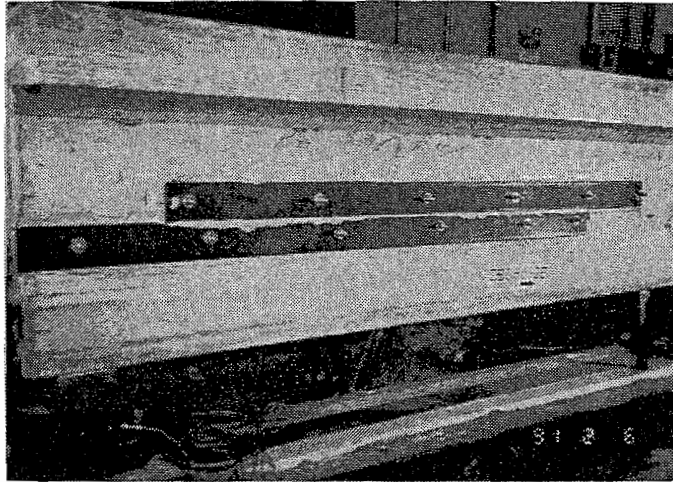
Flexural Failure With Splitting Crack in Transfer Zone at Strand F, DB850-2B
